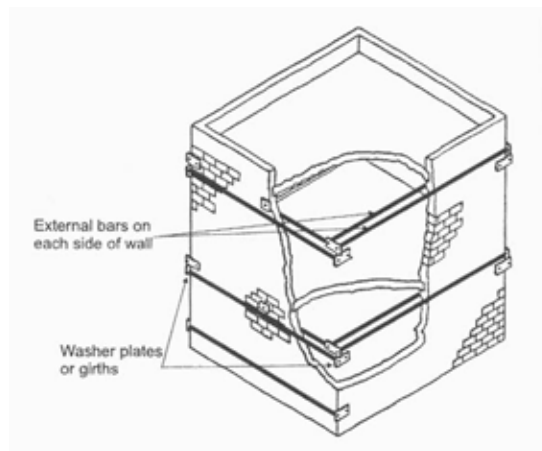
Use of external prestressing for strengthening masonry buildings
